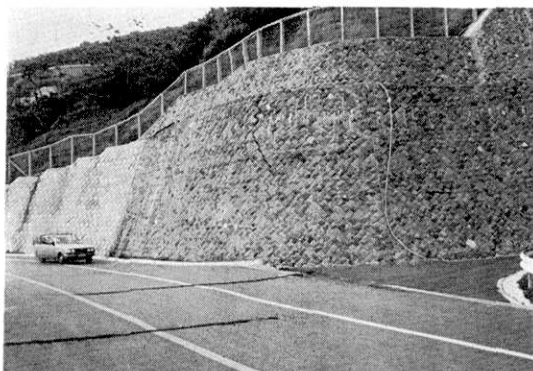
Cracks in the road and in a masonry retaining wall at loc. G-35.
